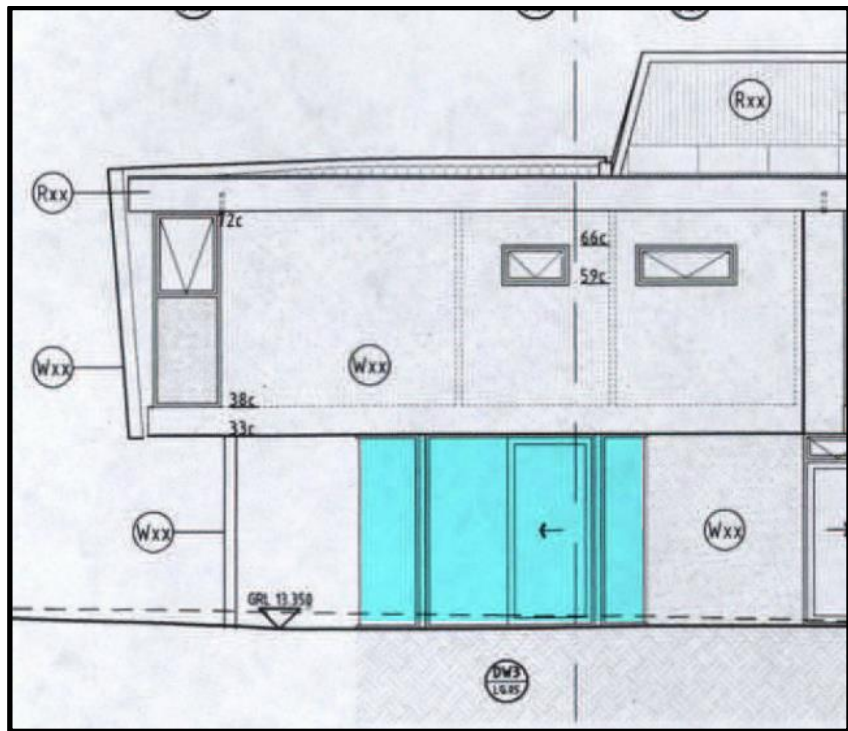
South elevation of the Family Room major opening at 27 Waverley Street (major opening highlighted blue)
